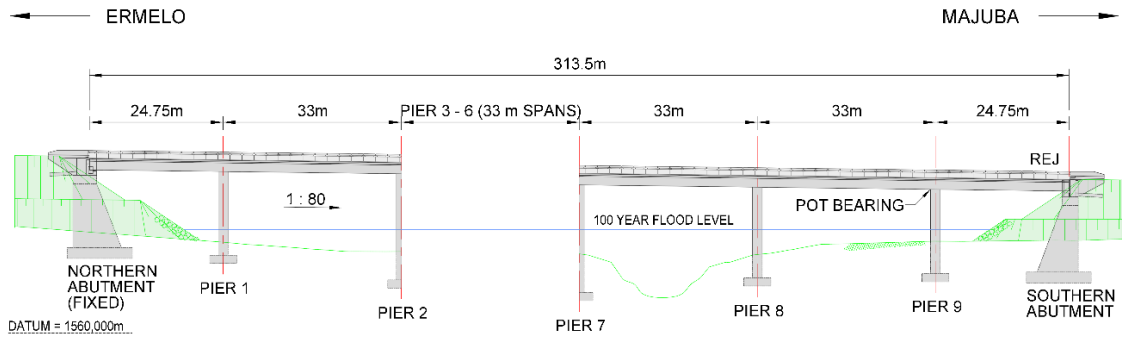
Majuba Rail Bridge Longitudinal Section
